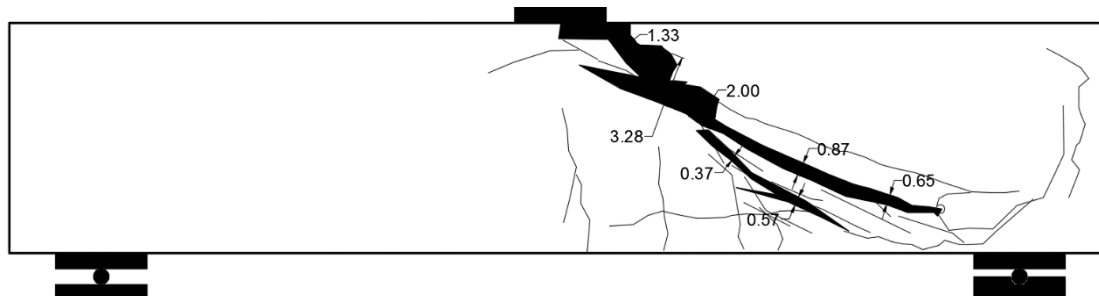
Crack pattern at failure for SNFRC 0.75% beam #24
